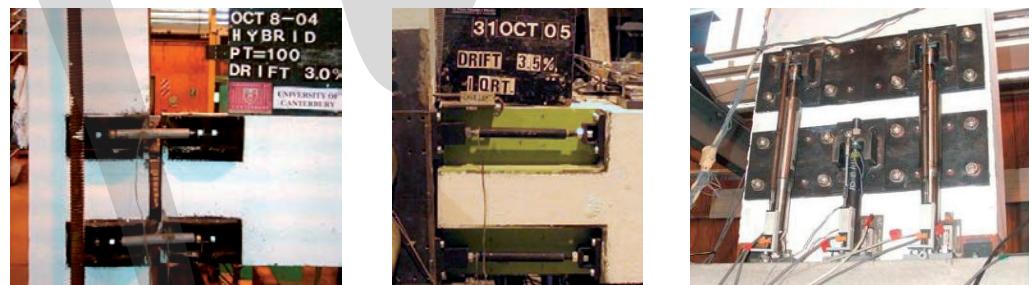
Alternative configurations of external dissipaters for hybrid systems: a. and b. beam-to-column connections, with and without recesses in beam (from Pampanin et al., 2006; NZCS, 2010); c. wall systems combining central hysteretic dampers with two viscous dampers to form advanced flag-shaped system (from Marriott et al., 2008; NZCS, 2010)
